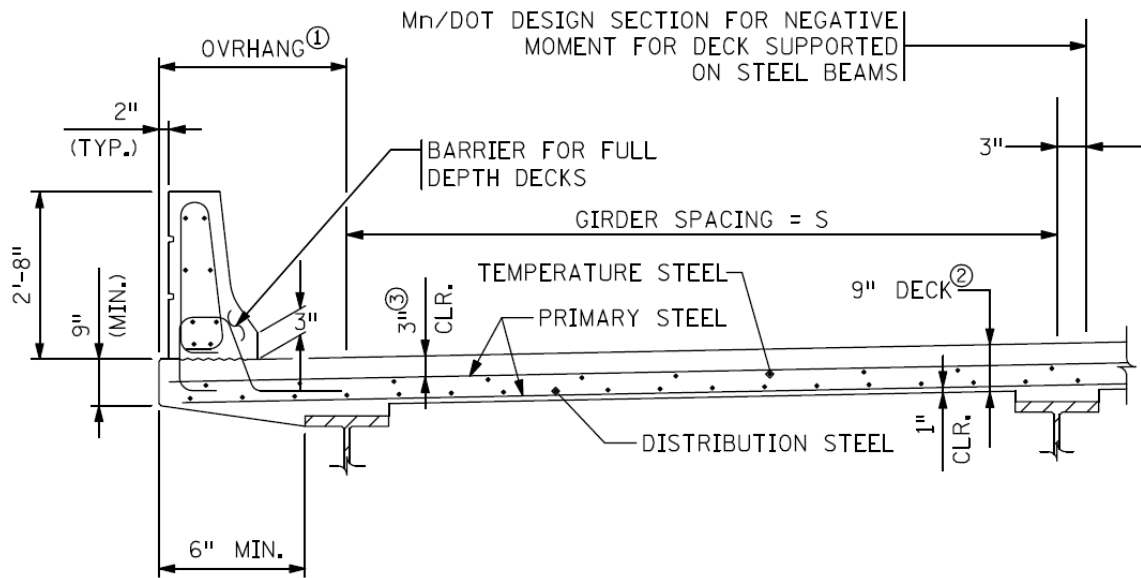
Layout of steel in a typical MnDOT concrete deck (from MnDOT LRFD Bridge Manual, 2010)
